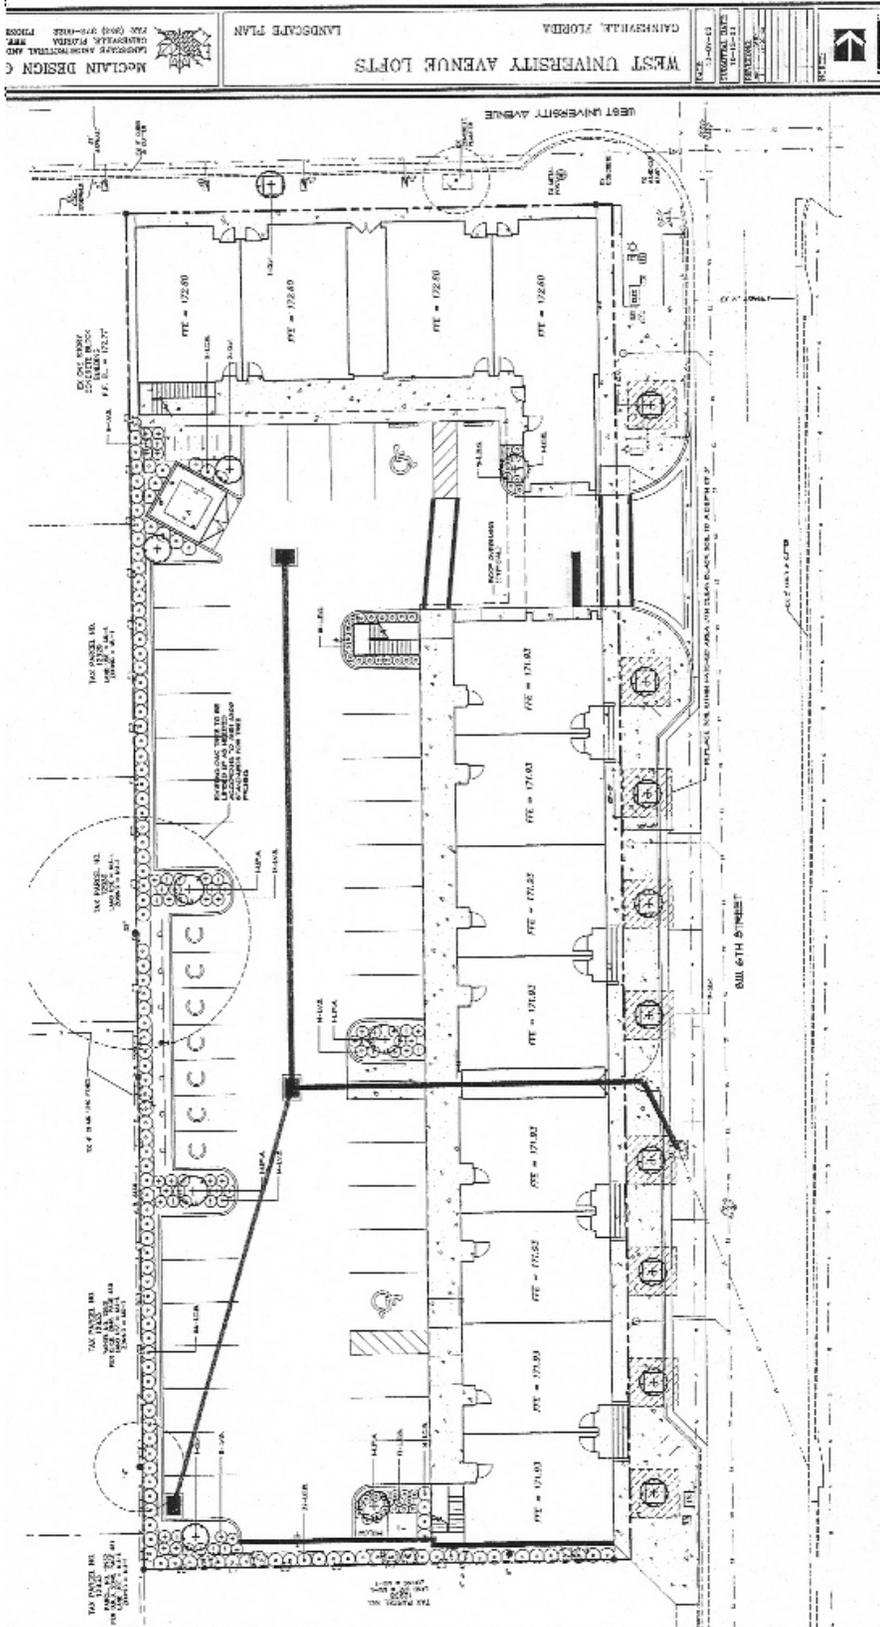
West University Ave. Lofts—Stormwater Drainage Network (Causseaux & Ellington 2003)
